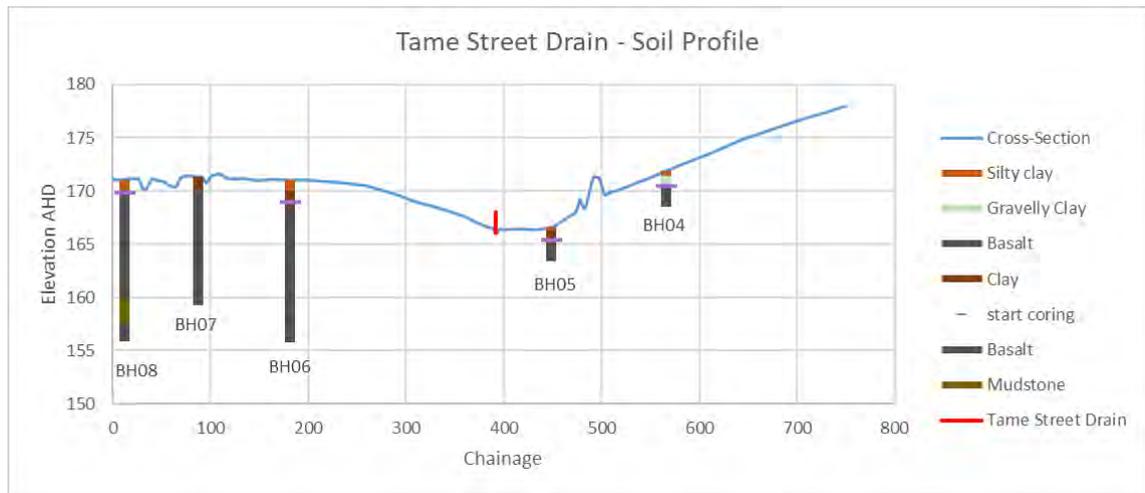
Tame Street Drain schematic soil profile cross-section
